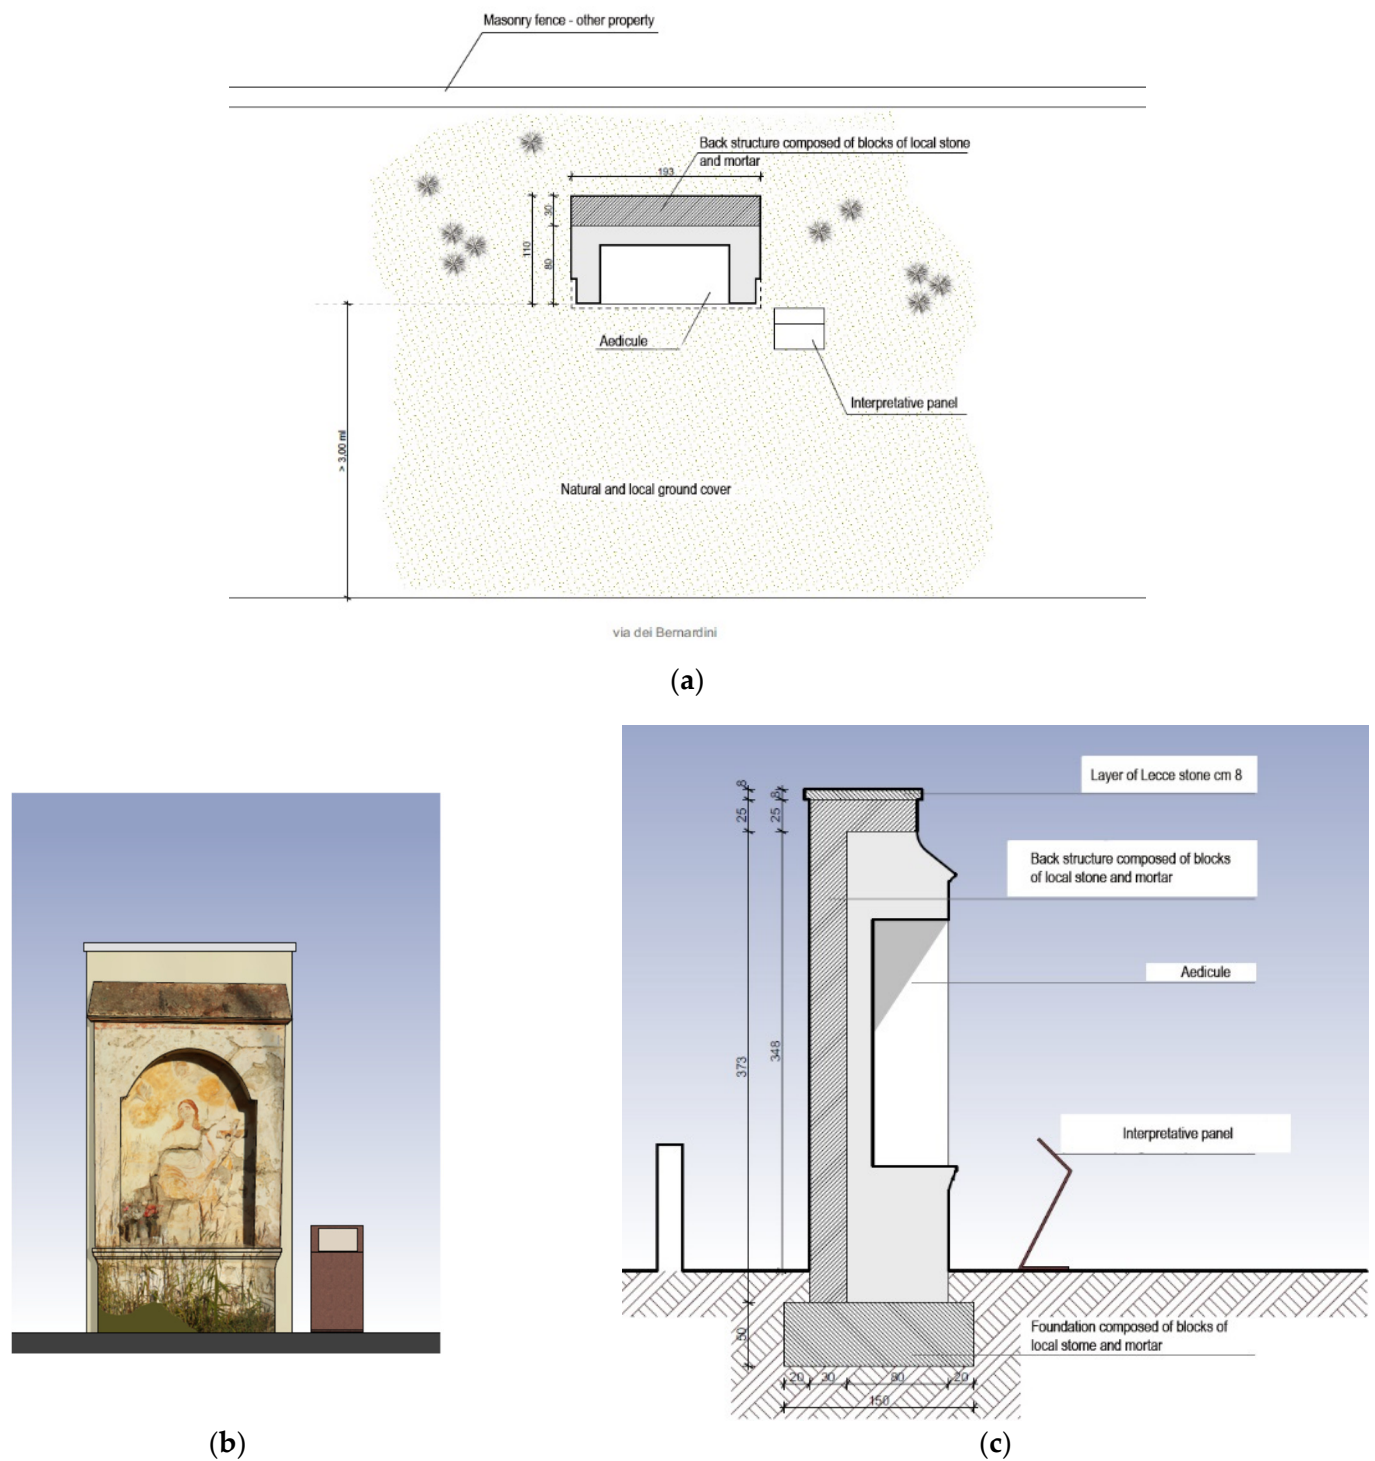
Project drawings: plan (a), elevation (b), section (c).
